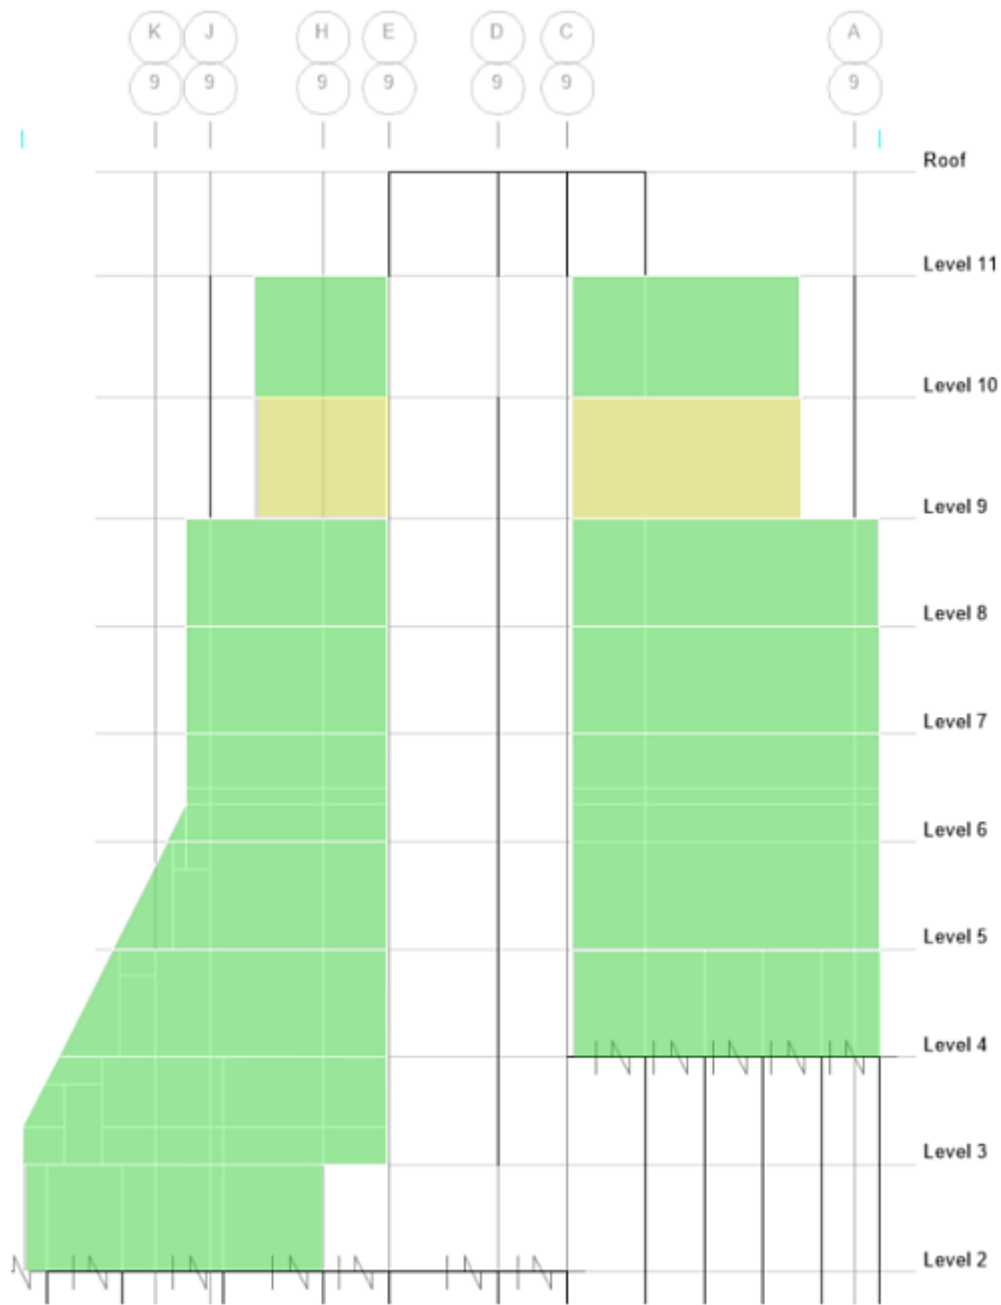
, Gridline 9 Transverse Direction Wall – South Structure
